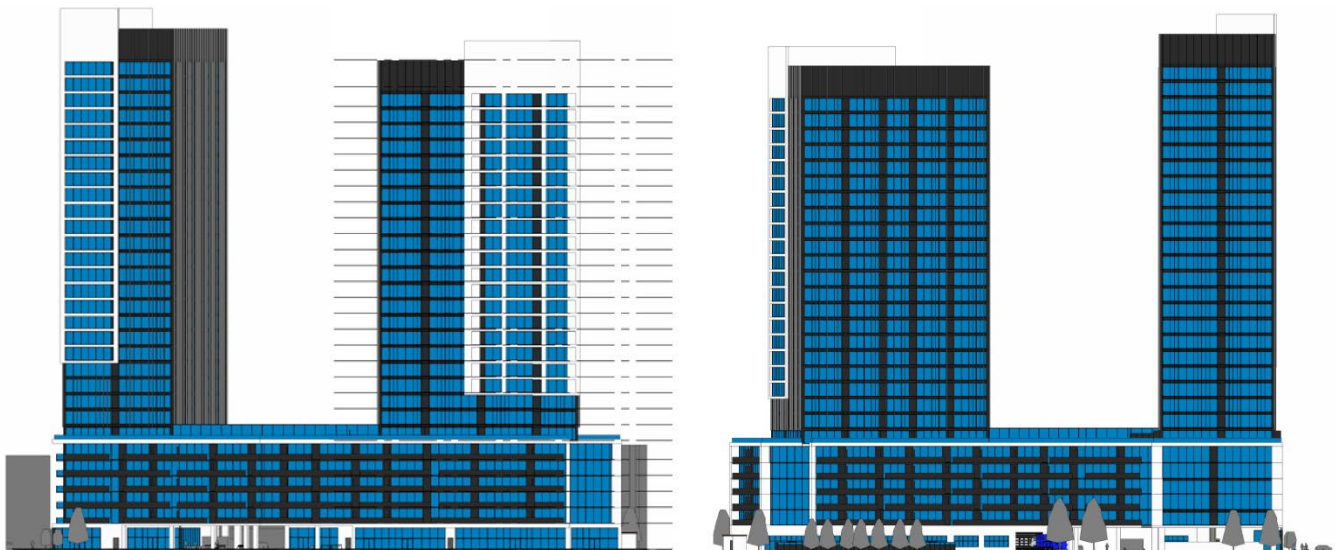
South elevation (left) and northeast elevation (right) (Source: Kasian Architecture and Interior Design)
